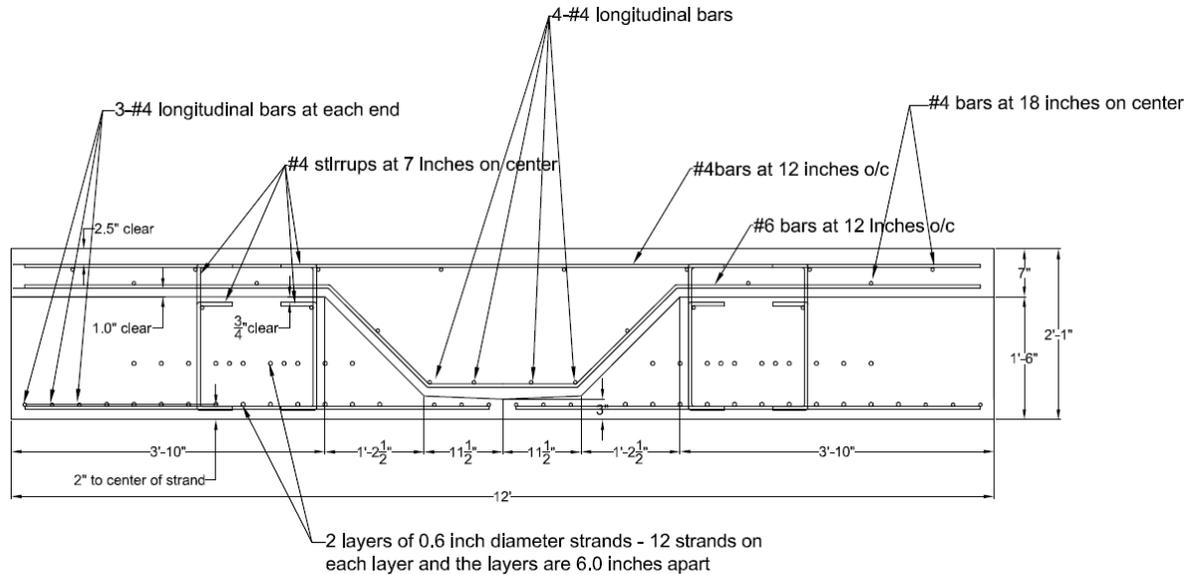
Reinforcing Details for Test Specimen #4 – Tapered web cross-sectional shape with no connection
